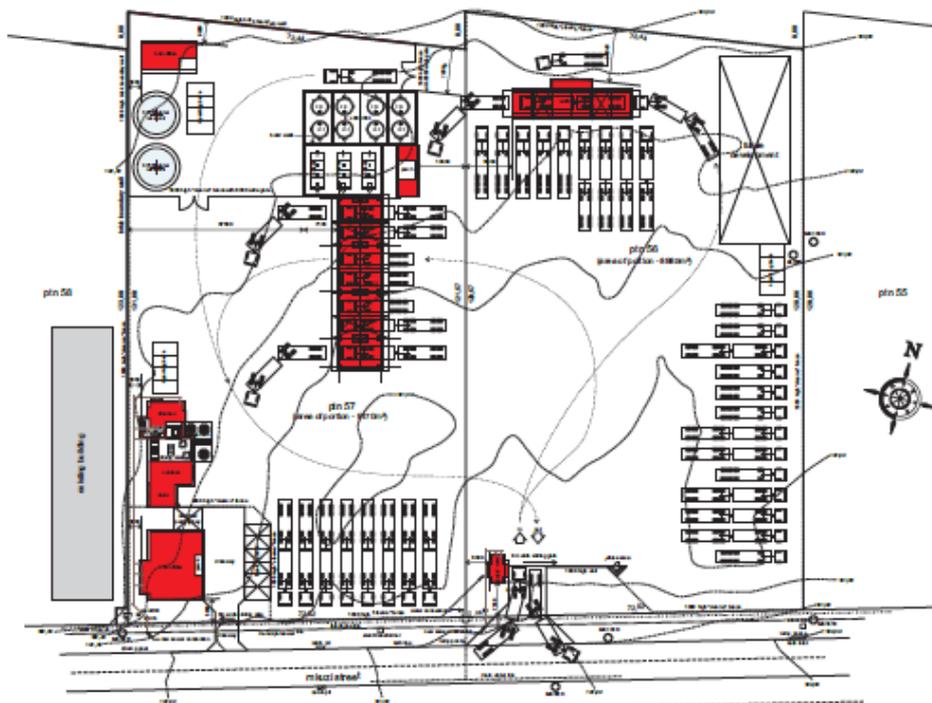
Site layout plan for the proposed truck stop and associated infrastructure on Erf 56 ad 57 in Mossdustria.
